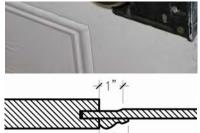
Door D303B molding type-8. (Photo: BBB, 2007)
